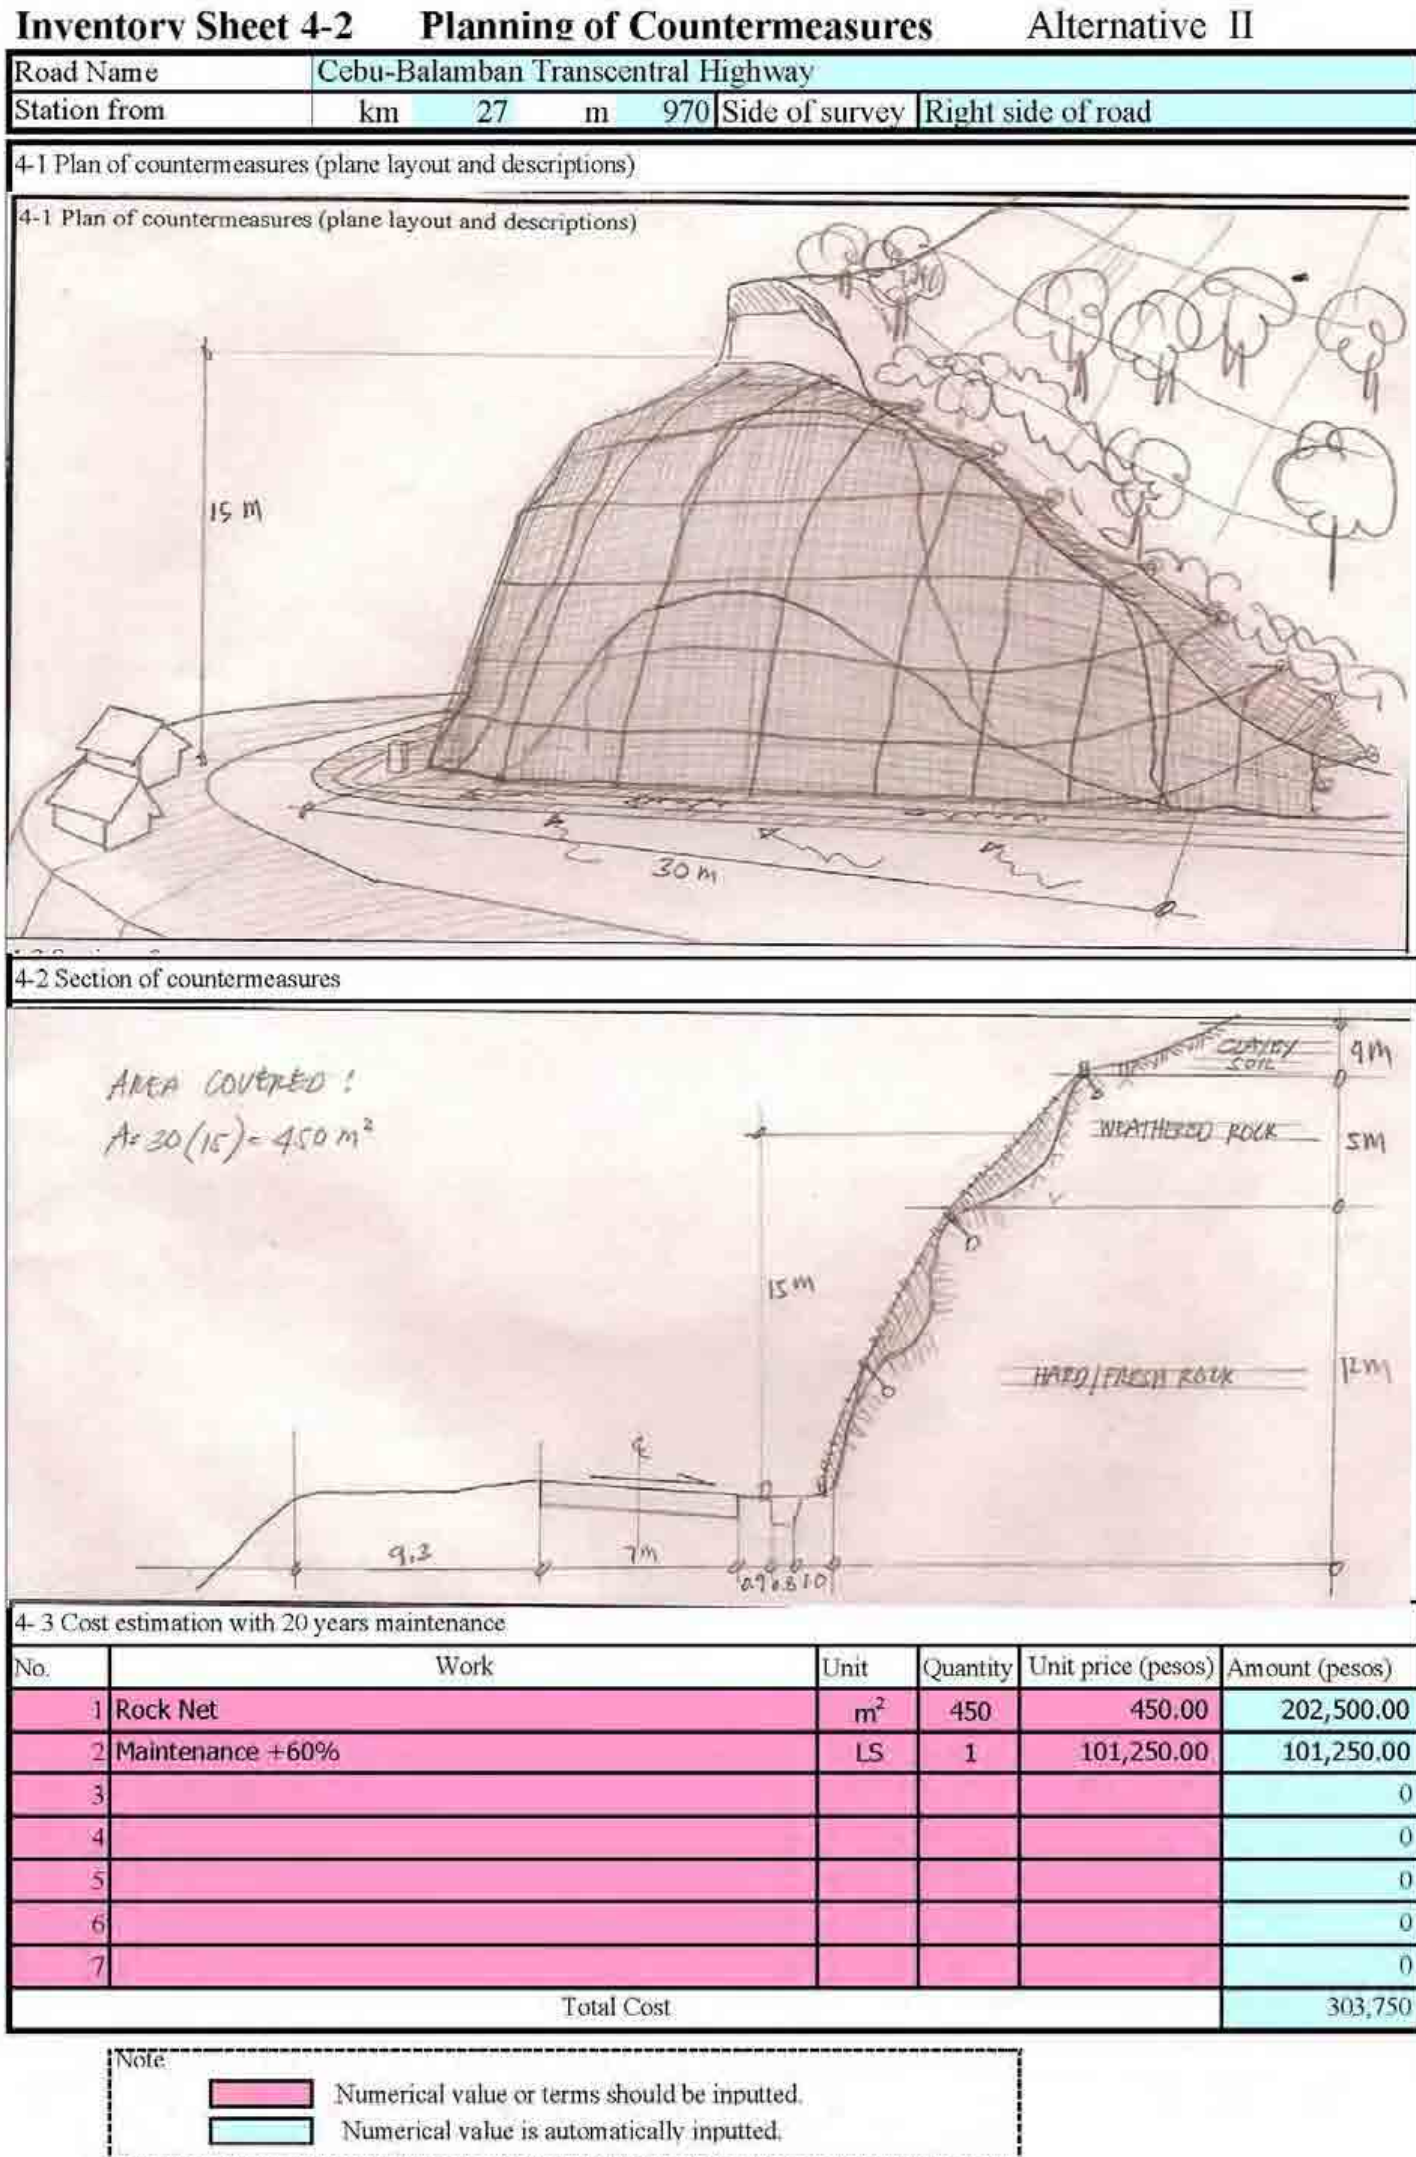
Example of Inventory Sheet 4-2: Planning of Countermeasure Alternative II for Rock Slope Collapse
